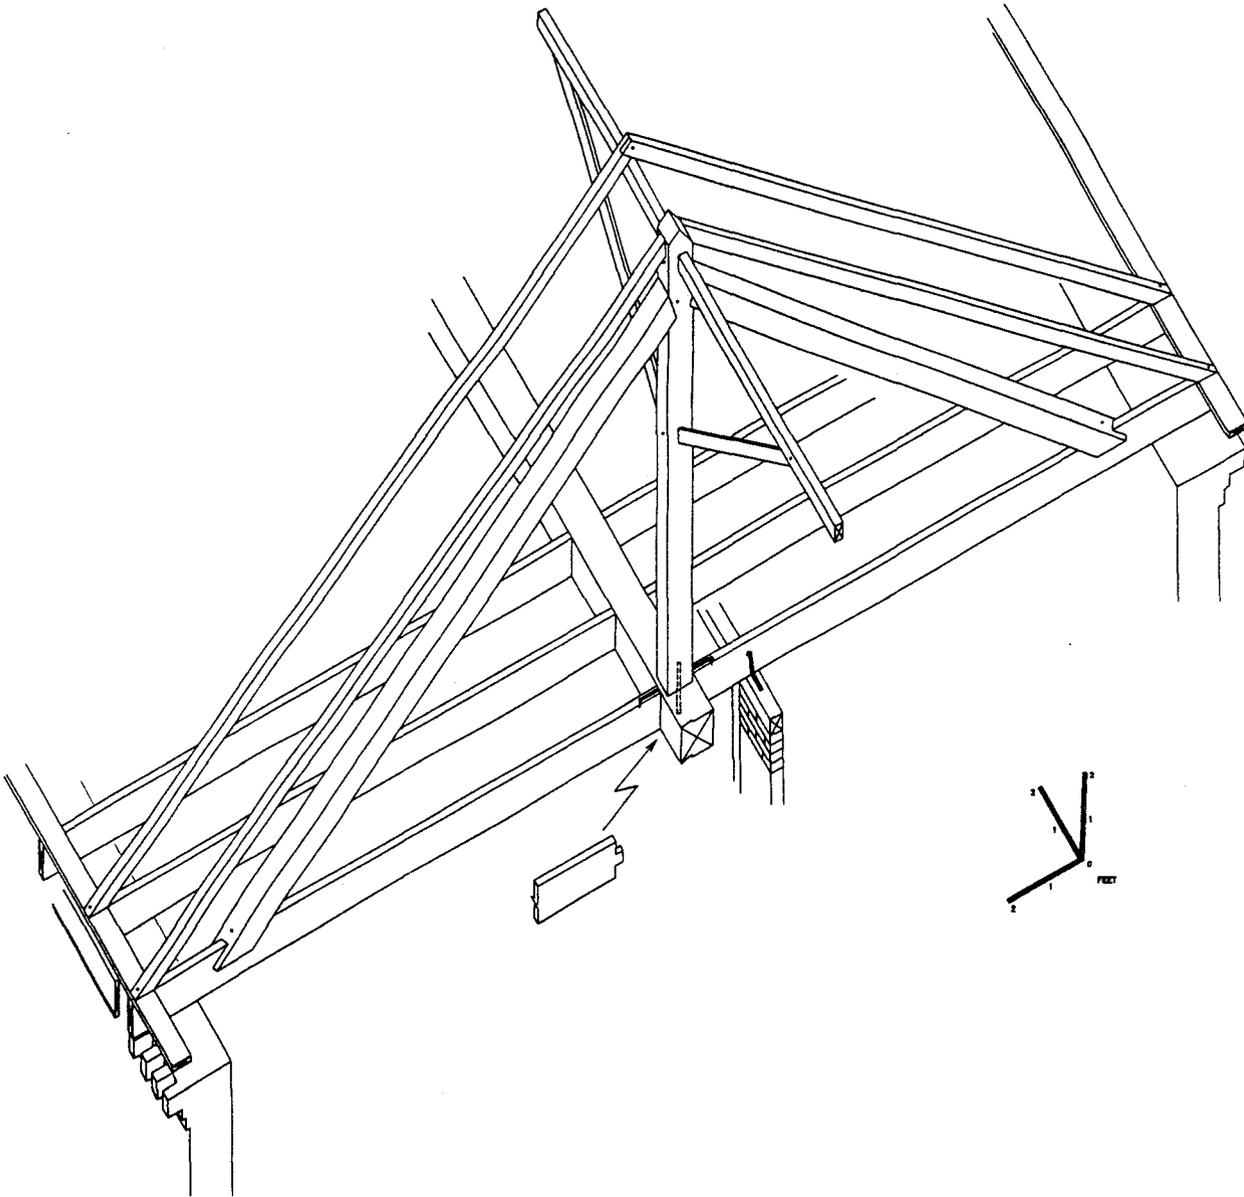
Detail of roof truss system at the Merkel House. The collar beams have been left out for clarity. Drawn by F. Mansberger.
